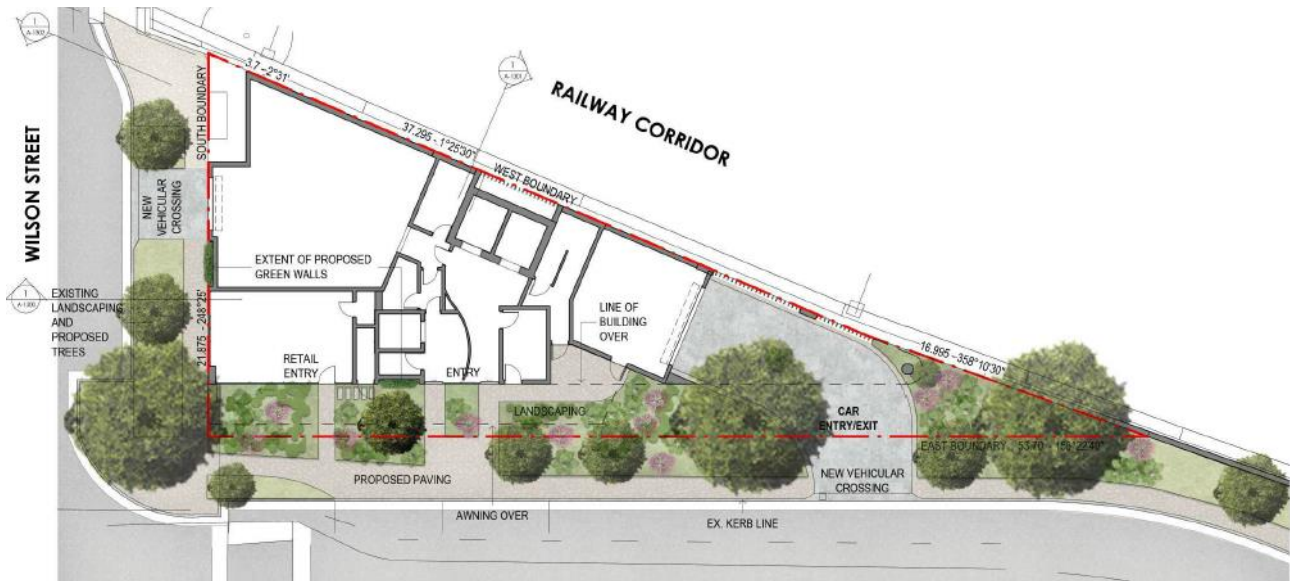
Landscaping plans, ground floor (source: Drew Dickson Architects)
